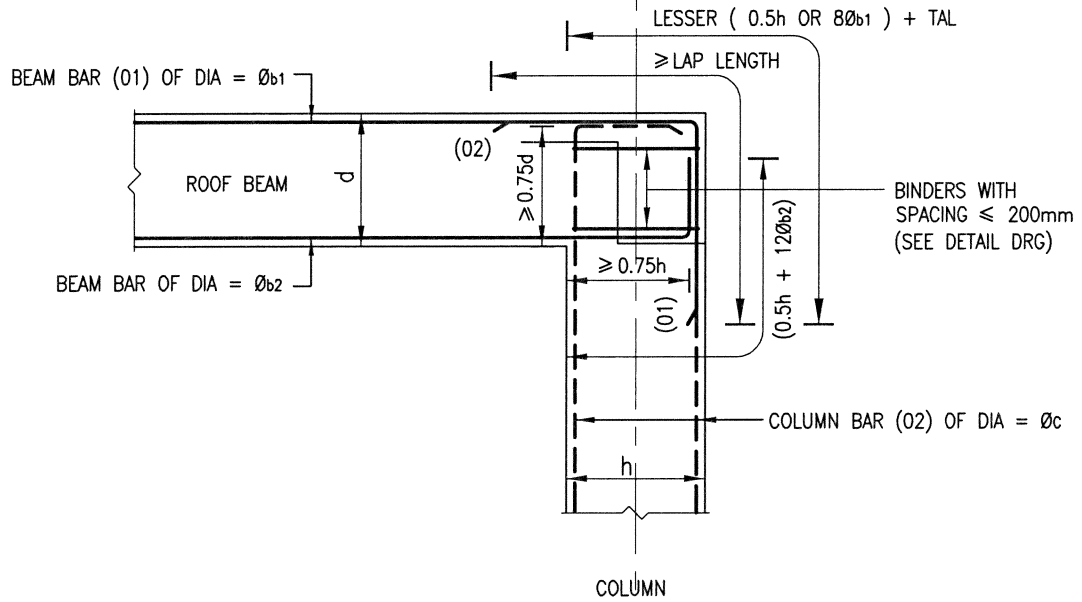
ROOF BEAM & EXTERIOR COLUMN JUNCTION
